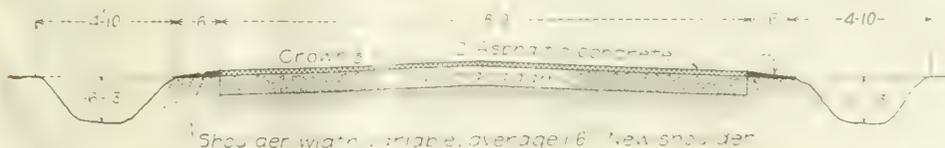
Typical Cross Section of Roads Improved. Note the Deep Ditches and Narrow Shoulders.
